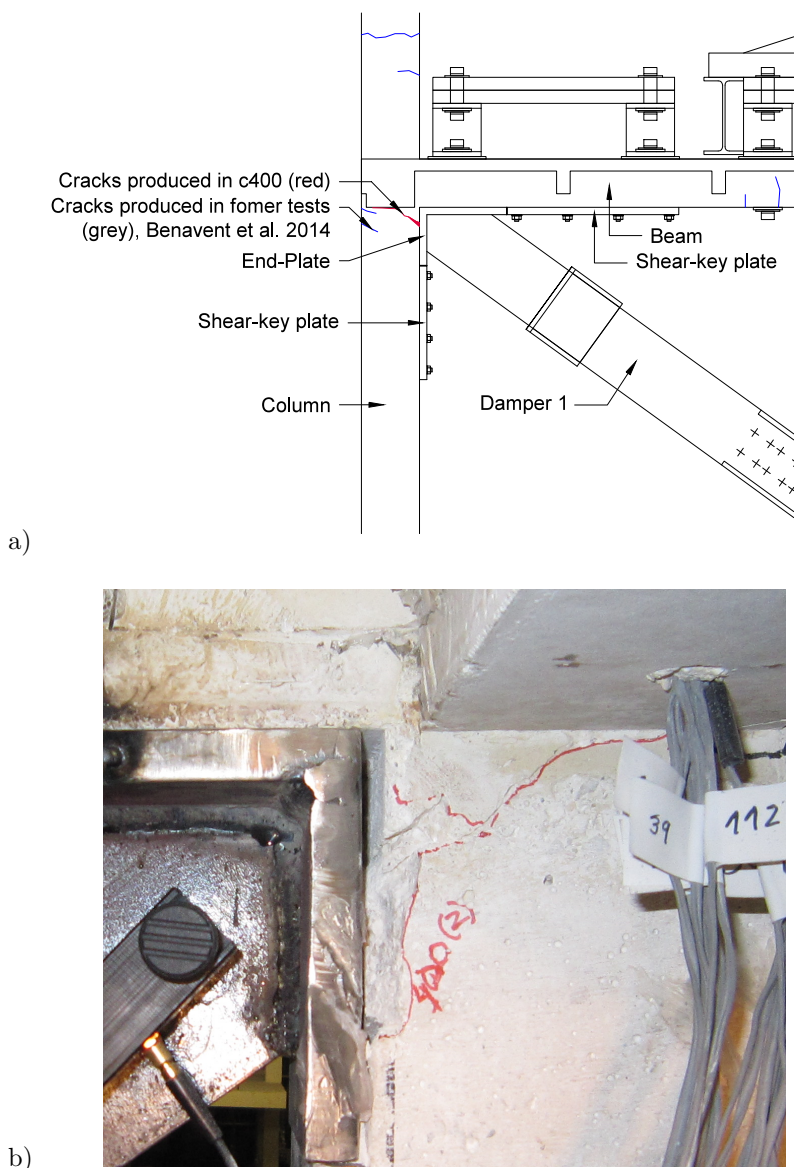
Crack pattern in the connection of dampers at the end of c400
